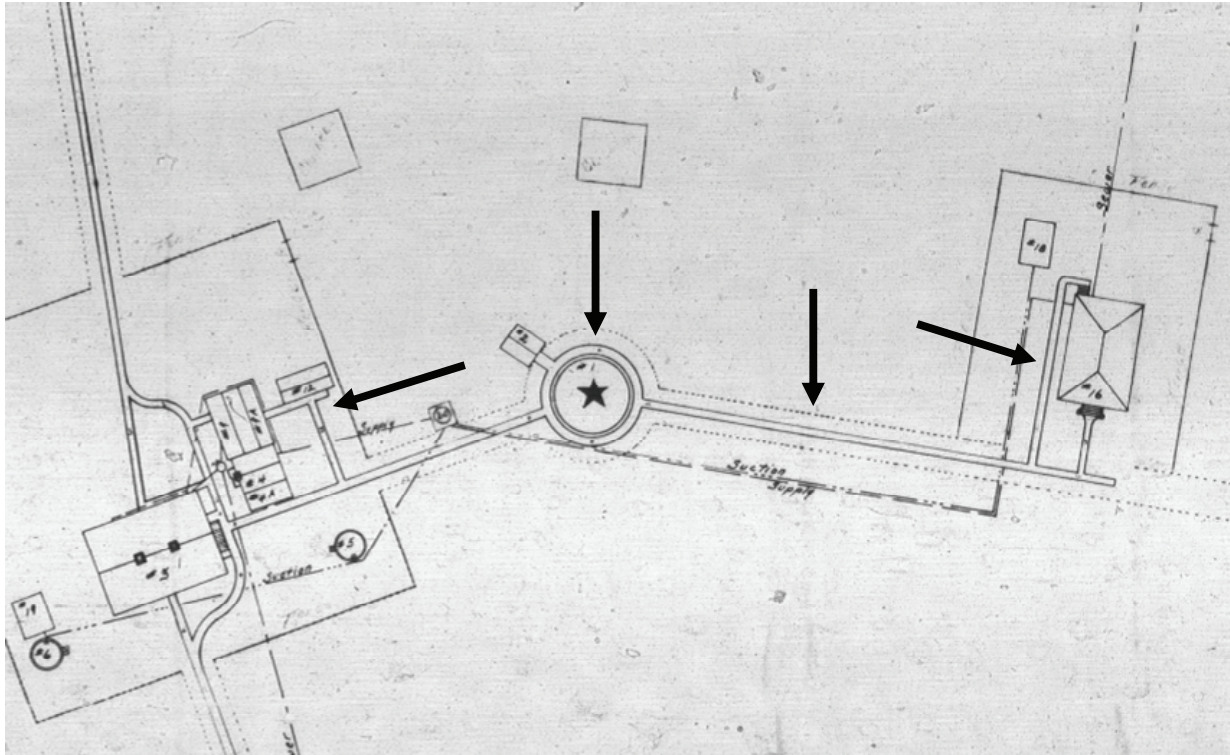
Close-up of circa 1925 Station site plan showing location of new walkways constructed in the 1920s.
